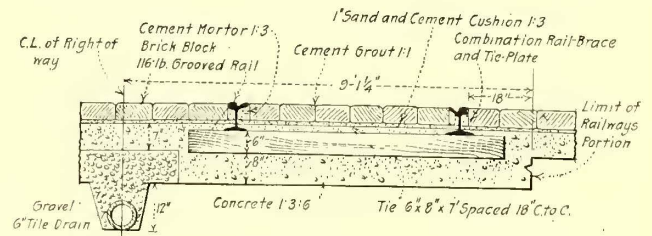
TRACK CONSTRUCTION ON HEAVILY-TRAVELED BUSINESS STREET
